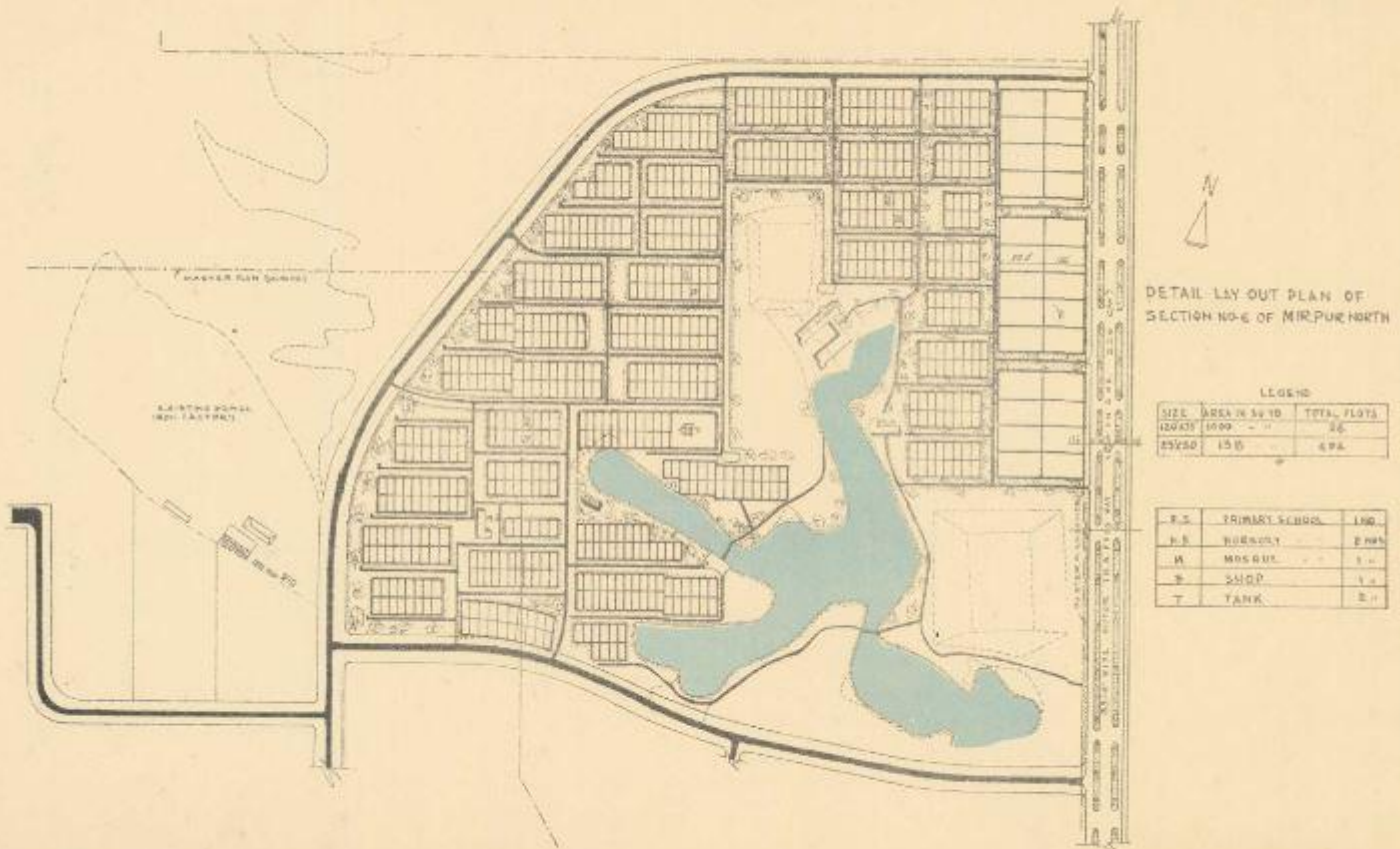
DETAIL PART LAY-OUT PLAN OF SECTION NO 6 OF MIRPUR NORTH.
